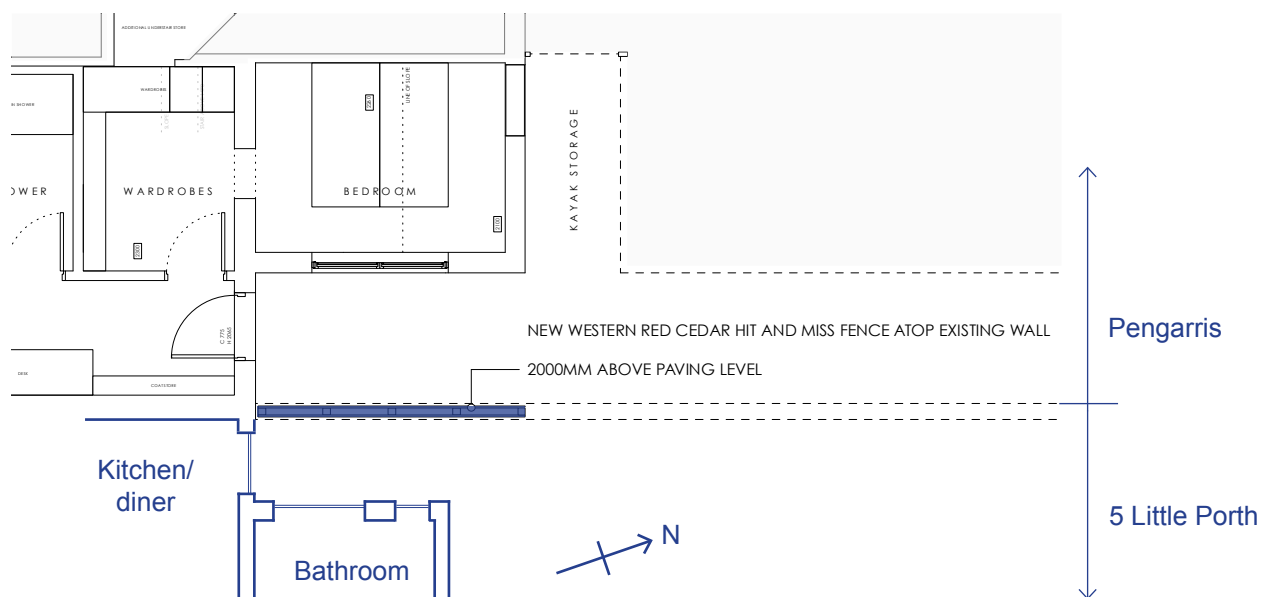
Mark-up of applicant's proposed plan showing the position of existing adjacent windows in 5 Little Porth. Additional drawing is shown in blue.
